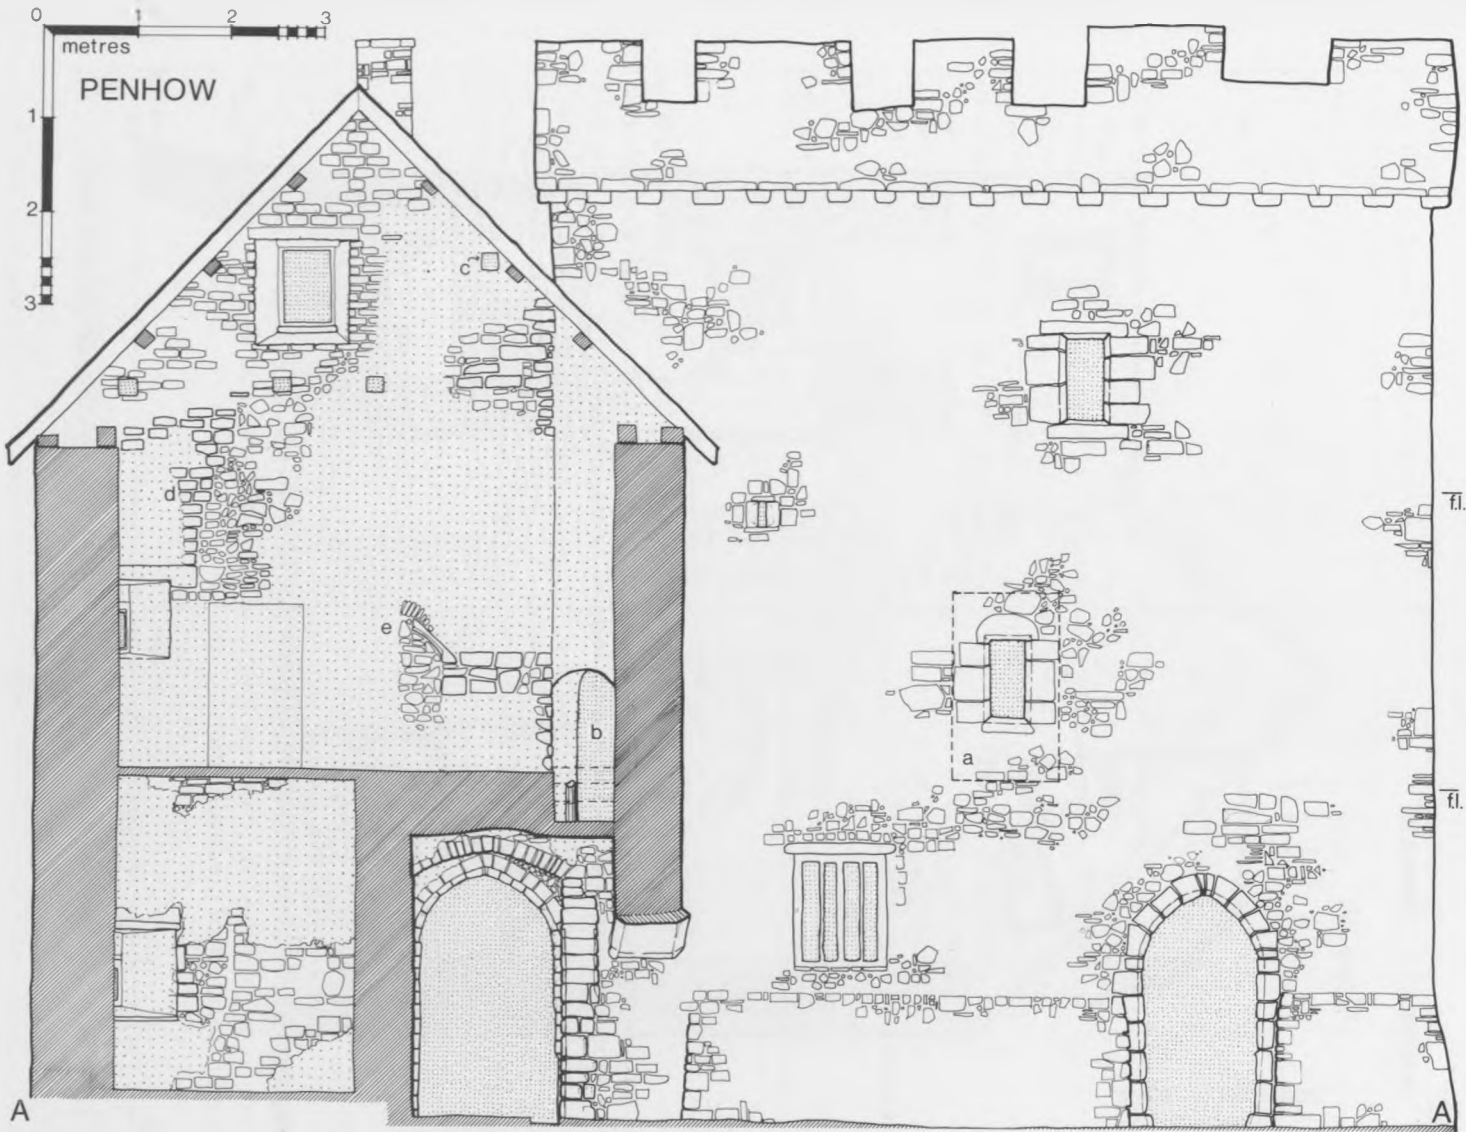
External east elevation of the Tower, and internal west end elevation of the Hall.
